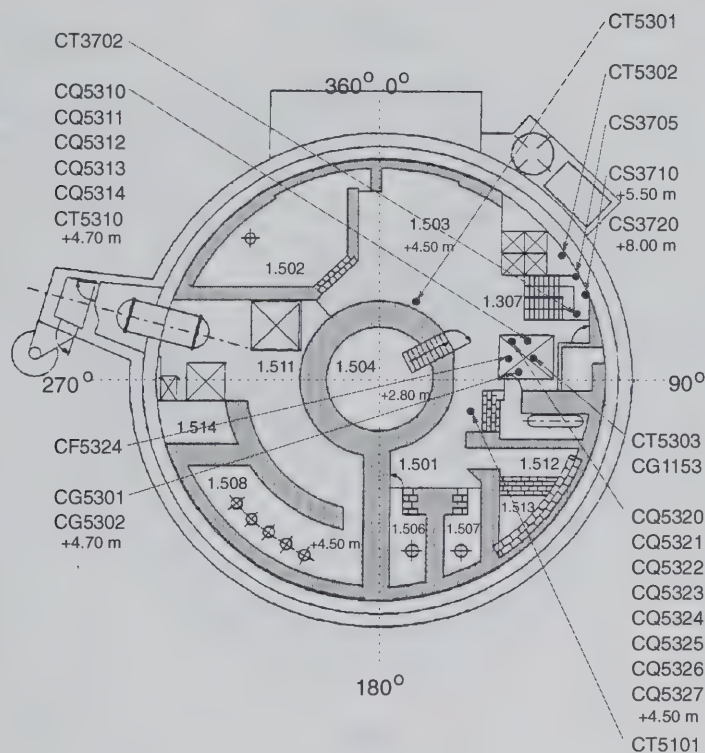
Level 1.500 at the +6.0 m Elevation
